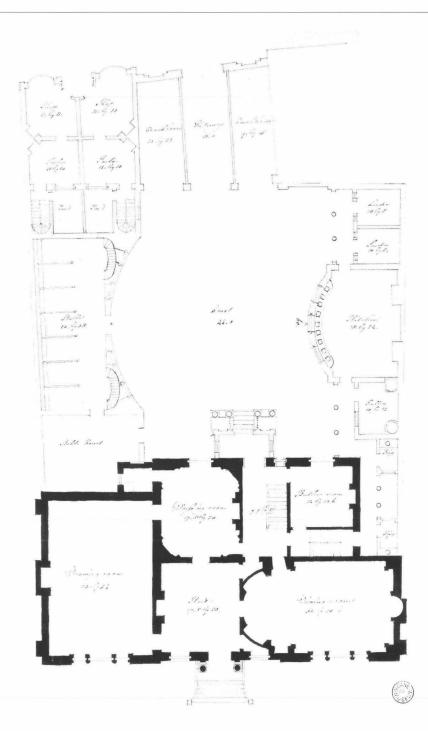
Robert Adam, ground plan of Marlborough House and proposals for the outbuildings and courtyard to the rear, or west, 1786, pen. (Source: Sir John Soane's Museum.)
